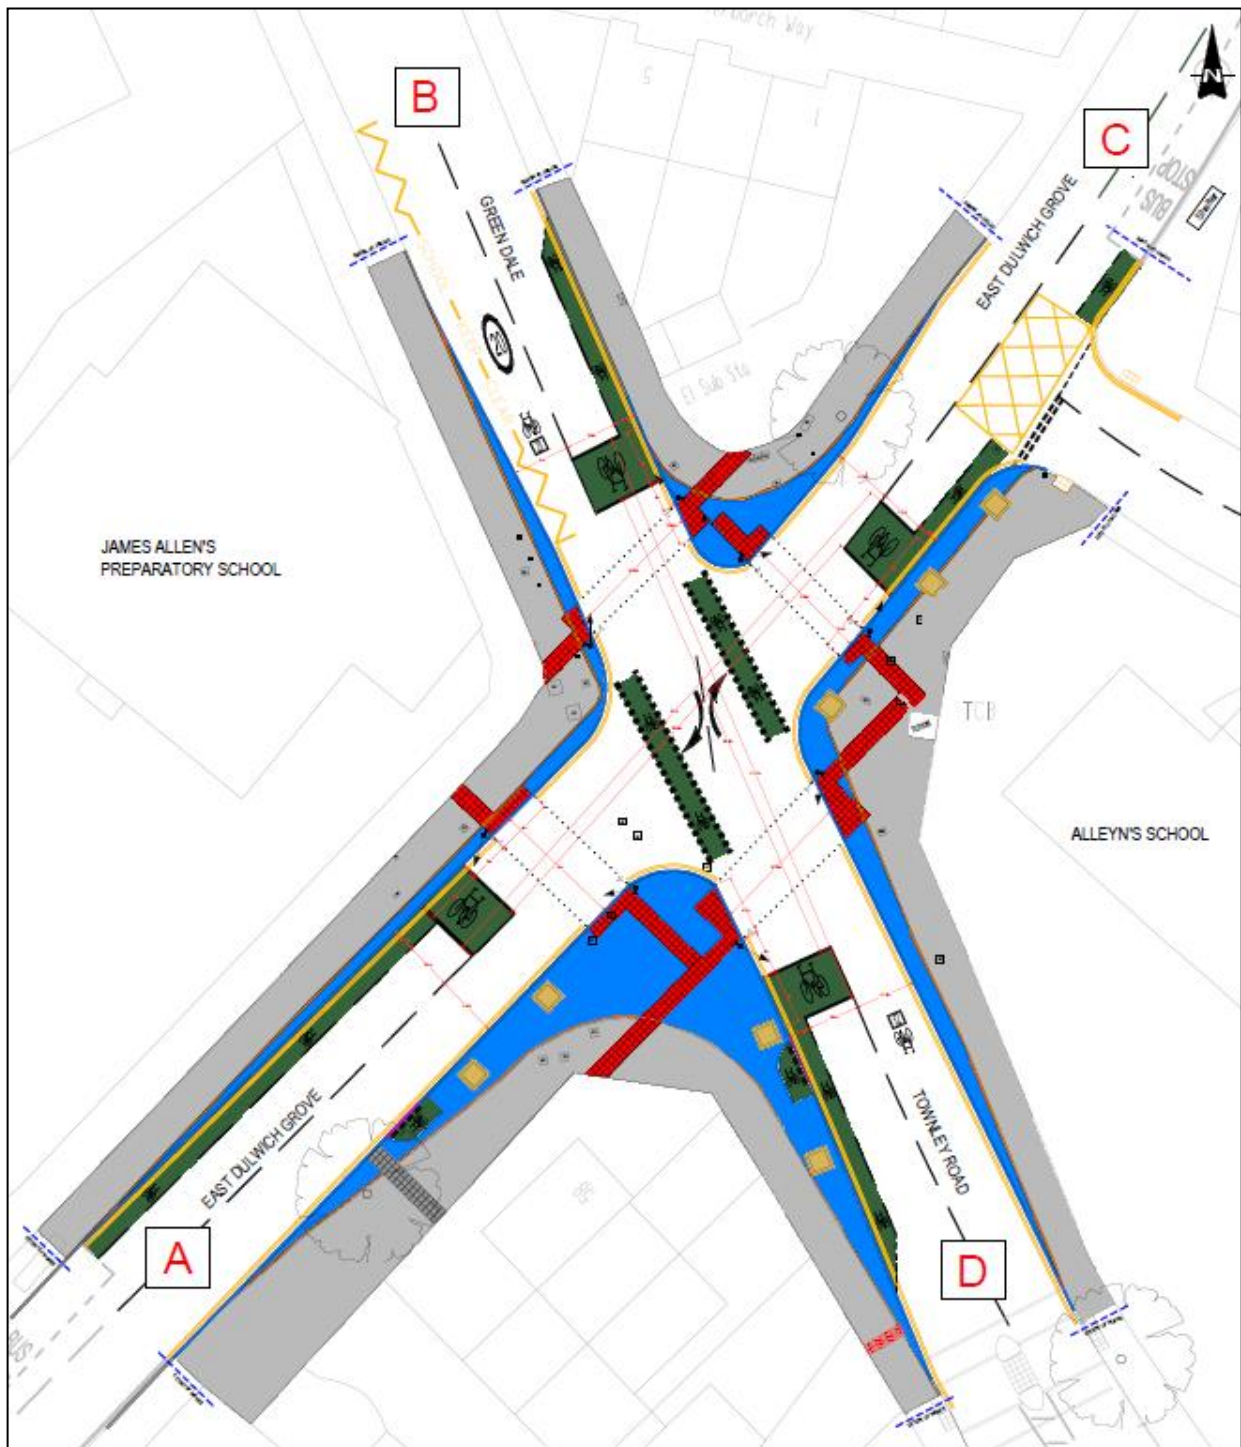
Figure C – Detailed Design Drawing of Option 2B No. D/EDG/CM/13/001/O2b
